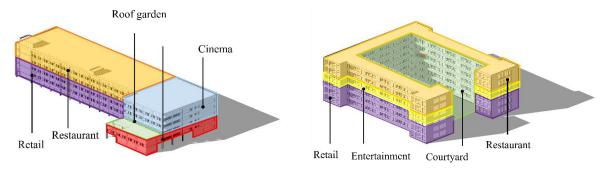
Functional Zoning of the Technology Building and the Complex Building After Renovation (Source:Seft-Drawn by the Author)
